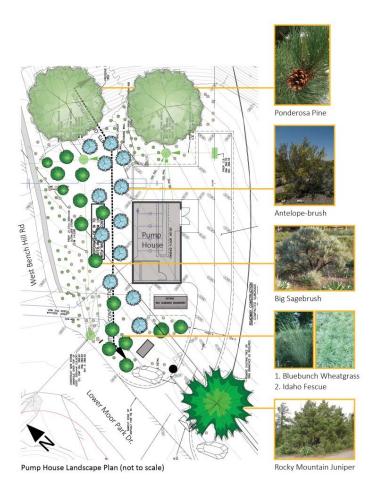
Landscaping Plan for the new West Bench Water Booster Station
